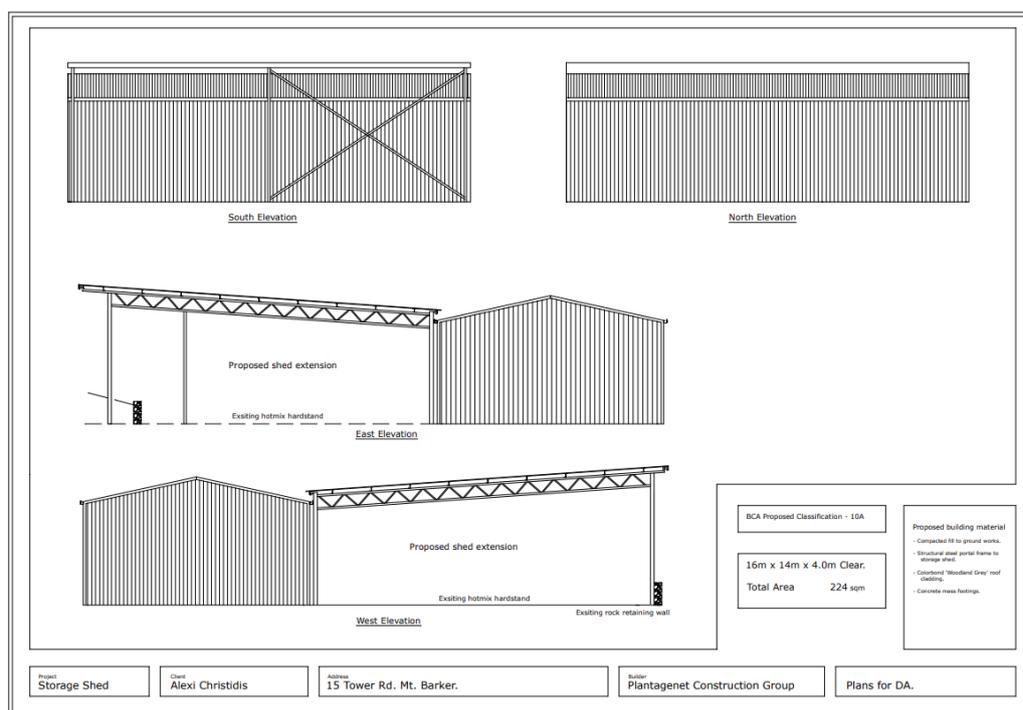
Elevation Plan – Lot 306 Tower Road, Mount Barker.
